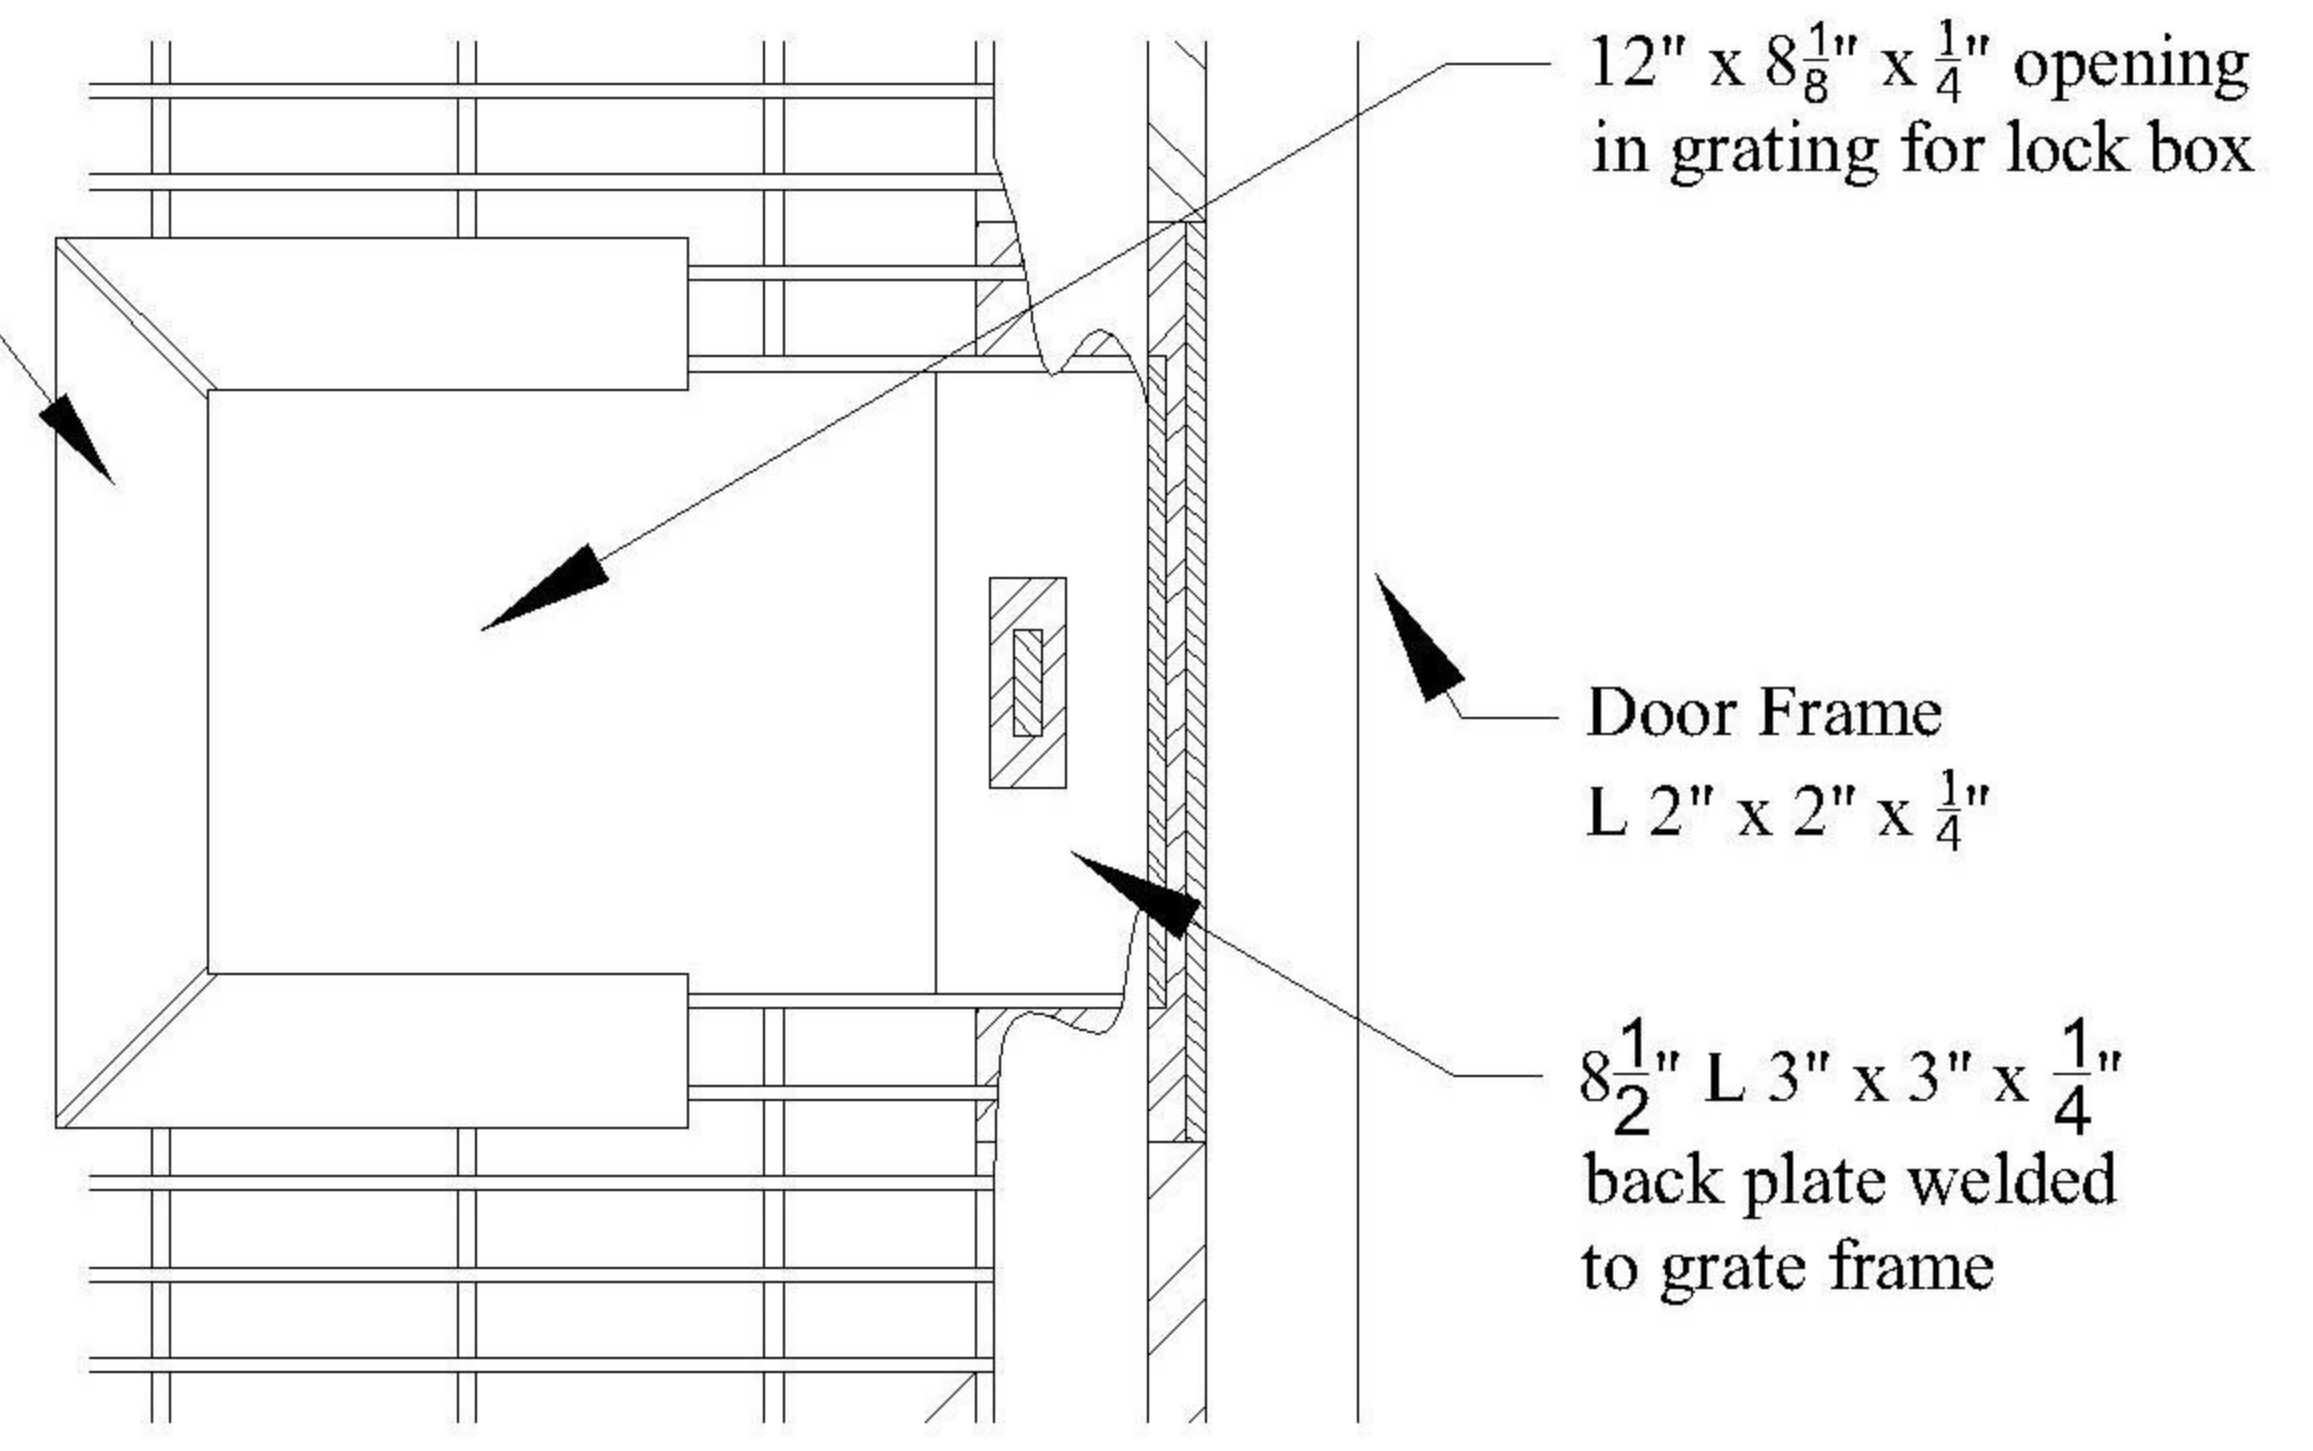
DETAIL LOCK BOX FRONT PLATE NOT SHOWN
